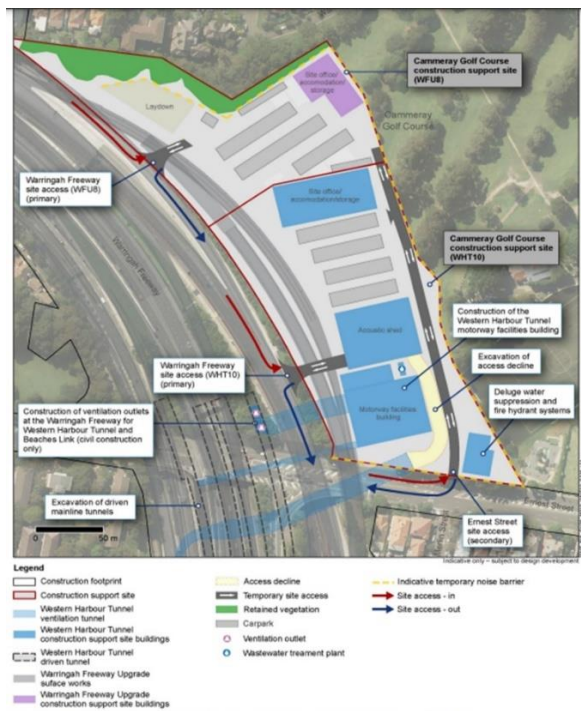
Indicative layout - Cammeray Golf Course construction support site
